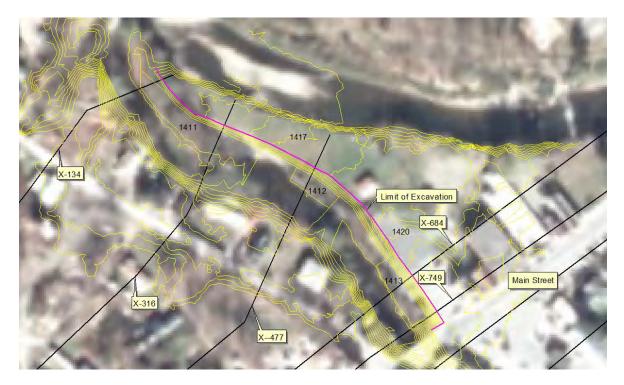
Plan View of Bench along Little Beaver Kill Downstream of Main Street Bridge
